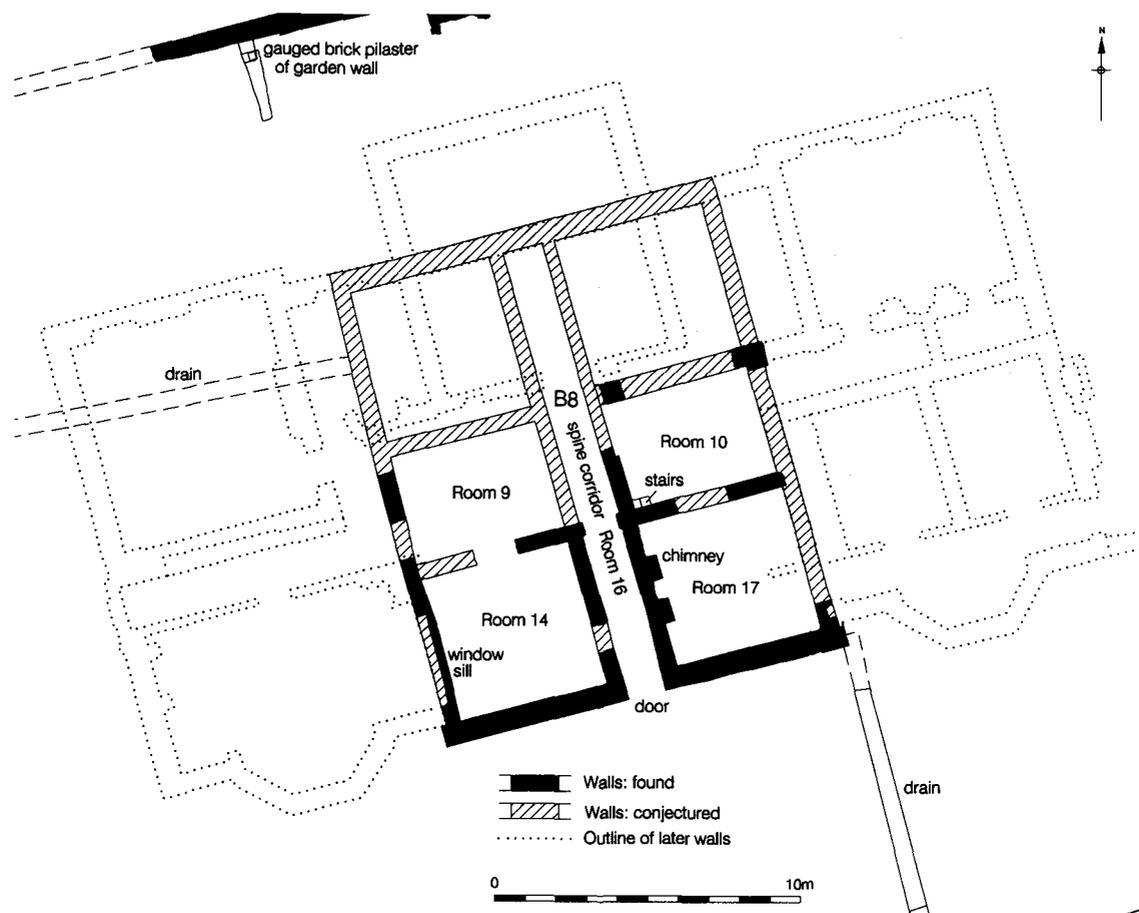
Phases 4 and 5: Building [B8] — floor plan interpretations (with outline of later building)
